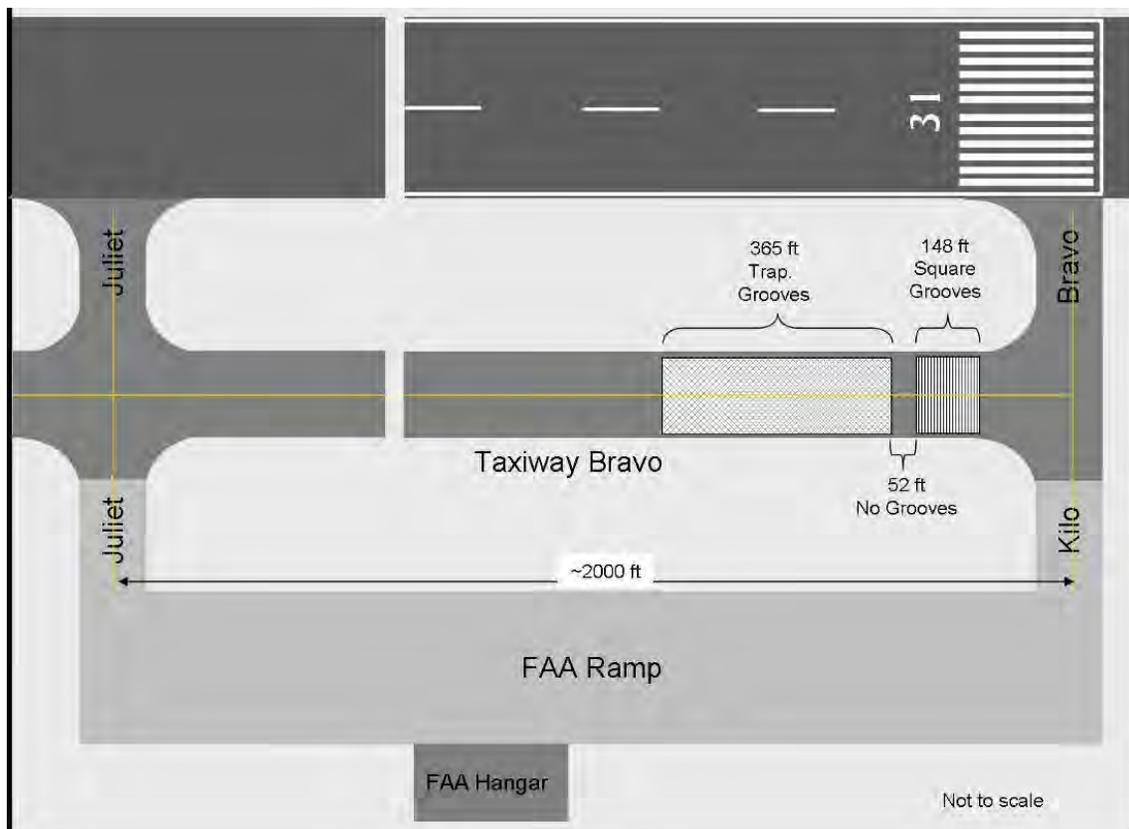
Details of ACY Trapezoidal-Shaped Groove Test Area
